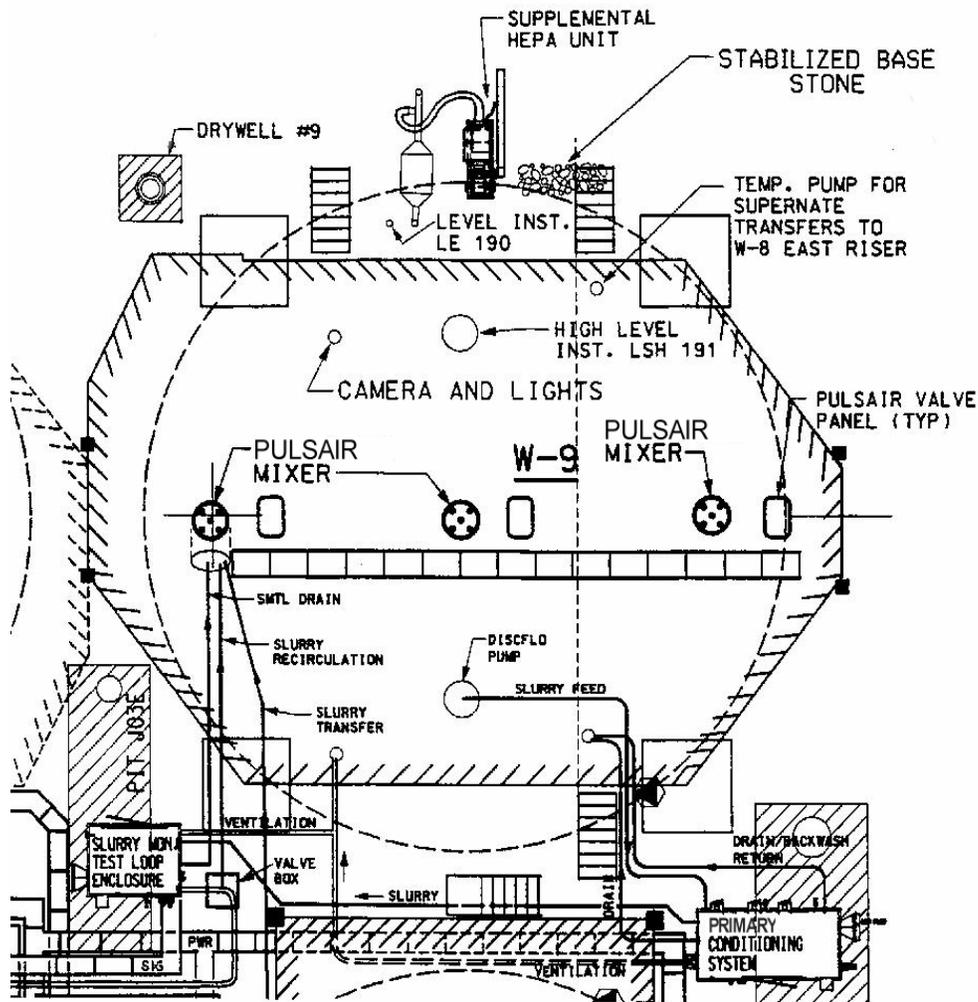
Sketch of the WCS layout at tank W-9.
